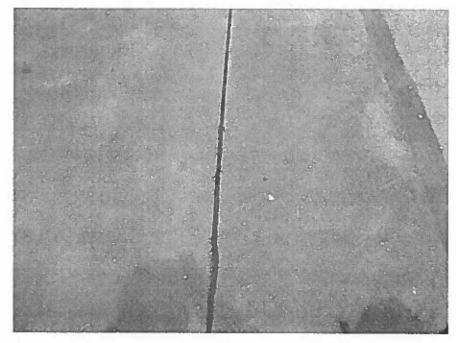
Cantilever Repair and Asphalt Replacement (5/14/19)
